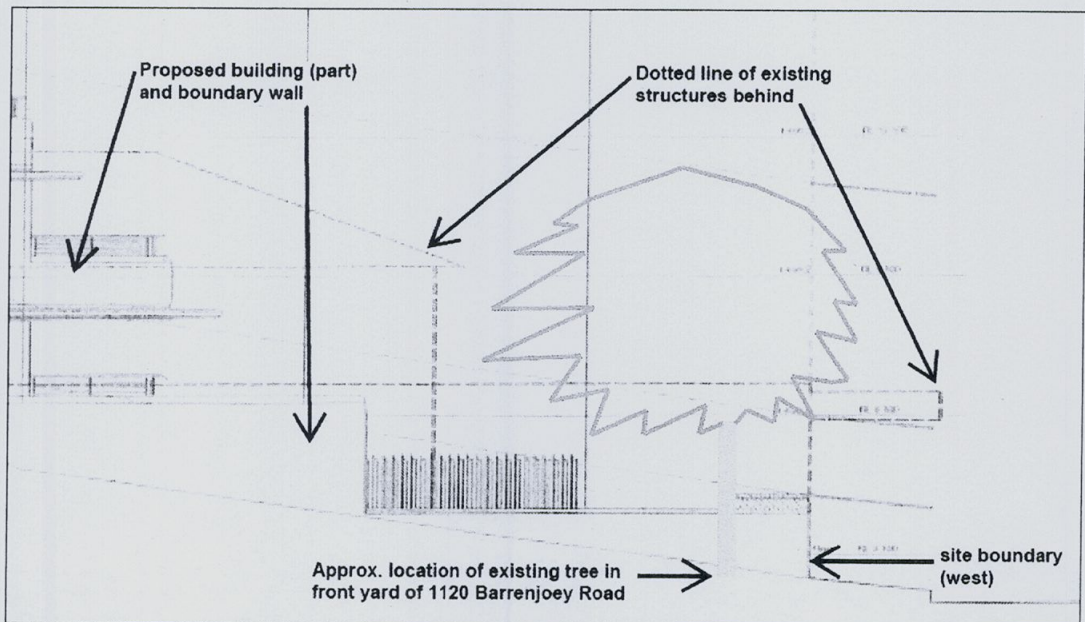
Mark up of north elevation showing the setback from the proposed building to the street frontage. The development will be well clear of the crown of Tree 7.
